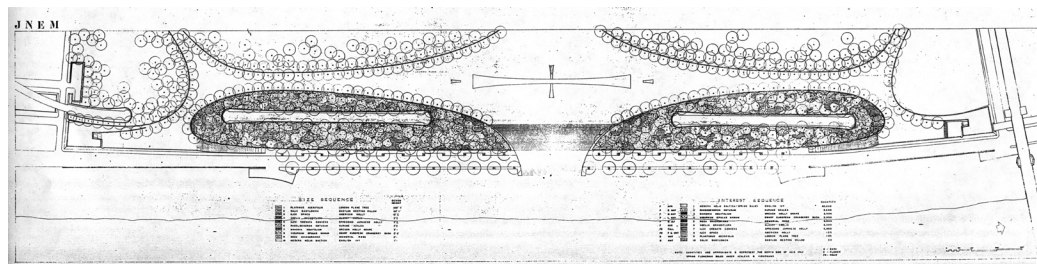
Office of Dan Kiley, planting plan of areas adjacent to railroad cuts, August 1960. (JNEM Archives, uncatalogued collection)
